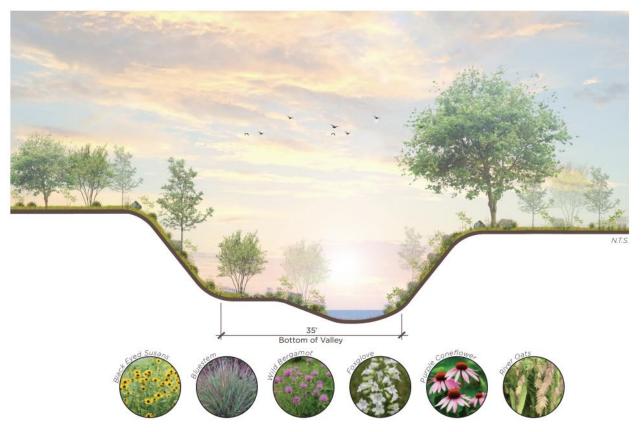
Mitigation design concept for culvert removal, stream daylighting and valley floor widening along Bishop Creek.
